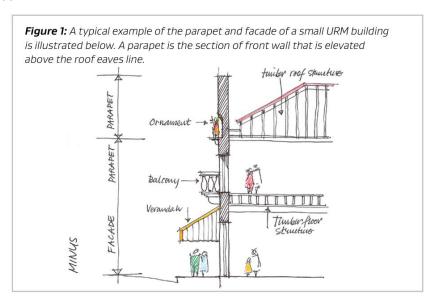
From MBIE Guideline Securing Parapets and Facades on URM buildings
